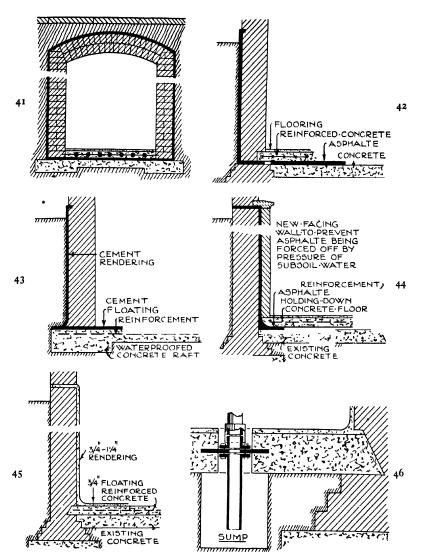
Cellar with exterior rendering of mastic asphalt and damp course through floor. FIG. 42. Basement in waterlogged ground (new work). Asphalt rendering on exterior of walls and damp course through reinforced concrete floor. FIG. 43. Basement in waterlogged ground (new work). Waterproofed and reinforced cement concrete floor and waterproofed cement floating and rendering. FIG. 44. Basement in waterlogged ground (old work). Asphalt rendering on internal face of walls and floor with retaining wall and holding-down layer of reinforced concrete. FIG. 45. Basement in waterlogged ground (old work). Concreting, floating, and rendering with waterproofed cement. FIG. 46. Sump fitted with pump suction-pipe for removing subsoil water.
